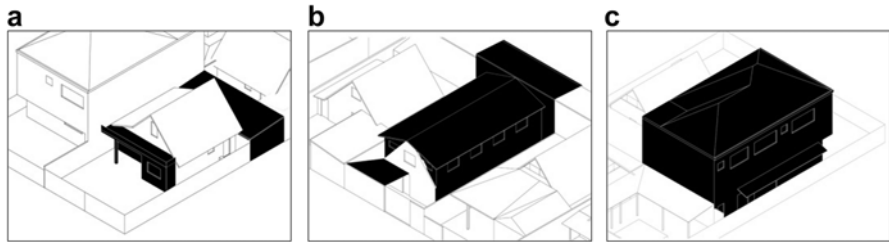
(a) Original plan, 1966, (b) actual plan, 2014, developed by authors
